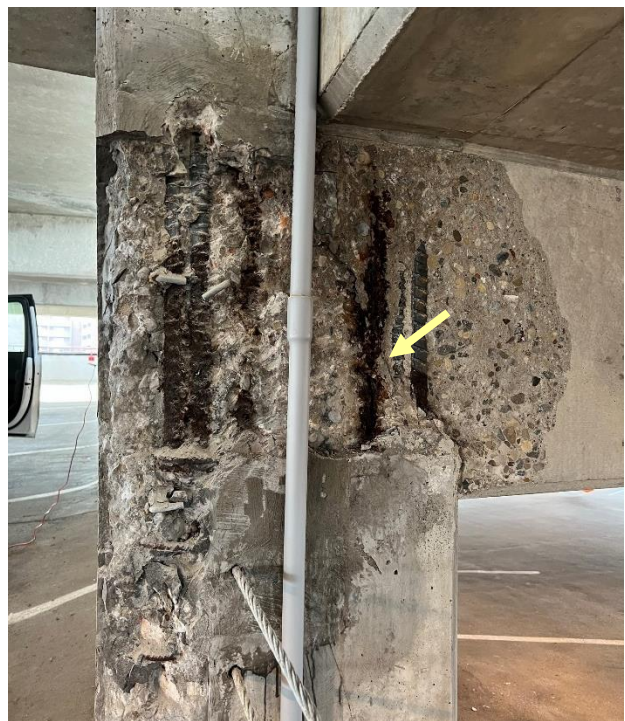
Exposed corroded reinforcing steel and diagonal concrete crack.
